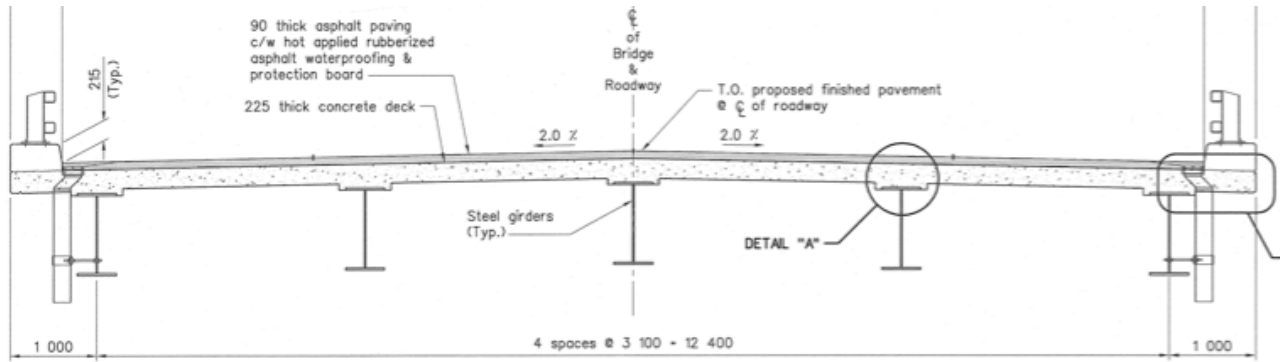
Cross section of sample steel bridge provided by Manitoba Infrastructure
